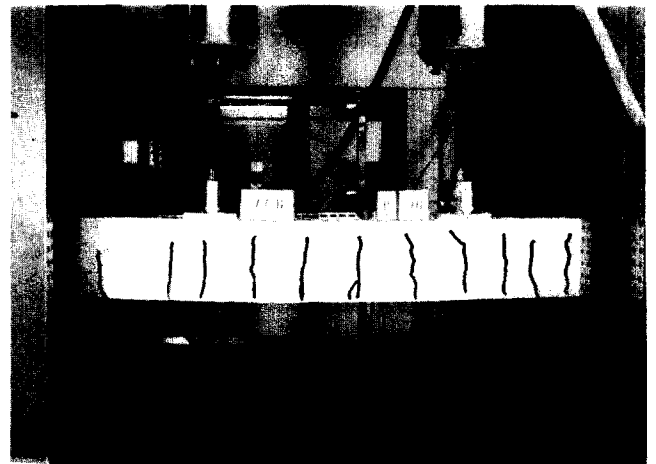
Crack configuration of bamboo reinforced beam VB1 after failure.
